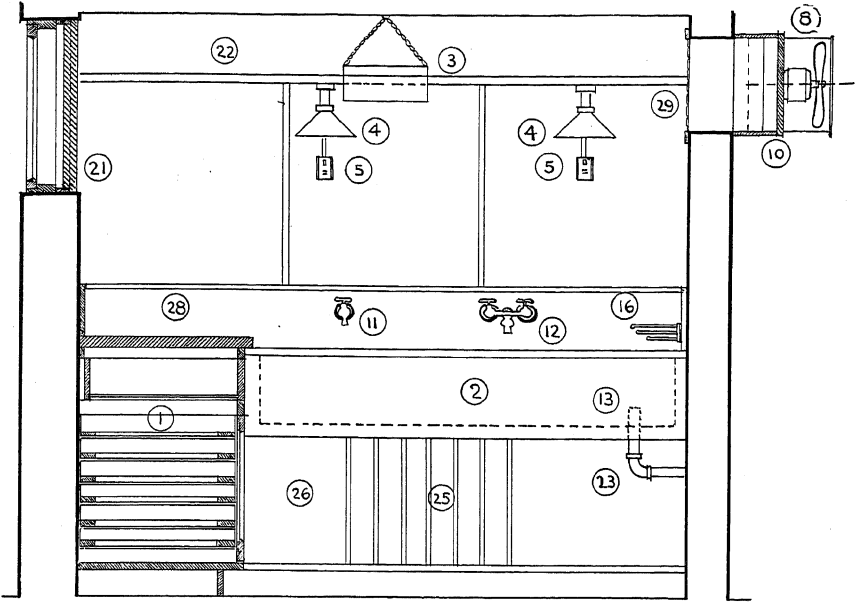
Elevation showing sink, exhaust fan, safe lights, drying racks, etc.
